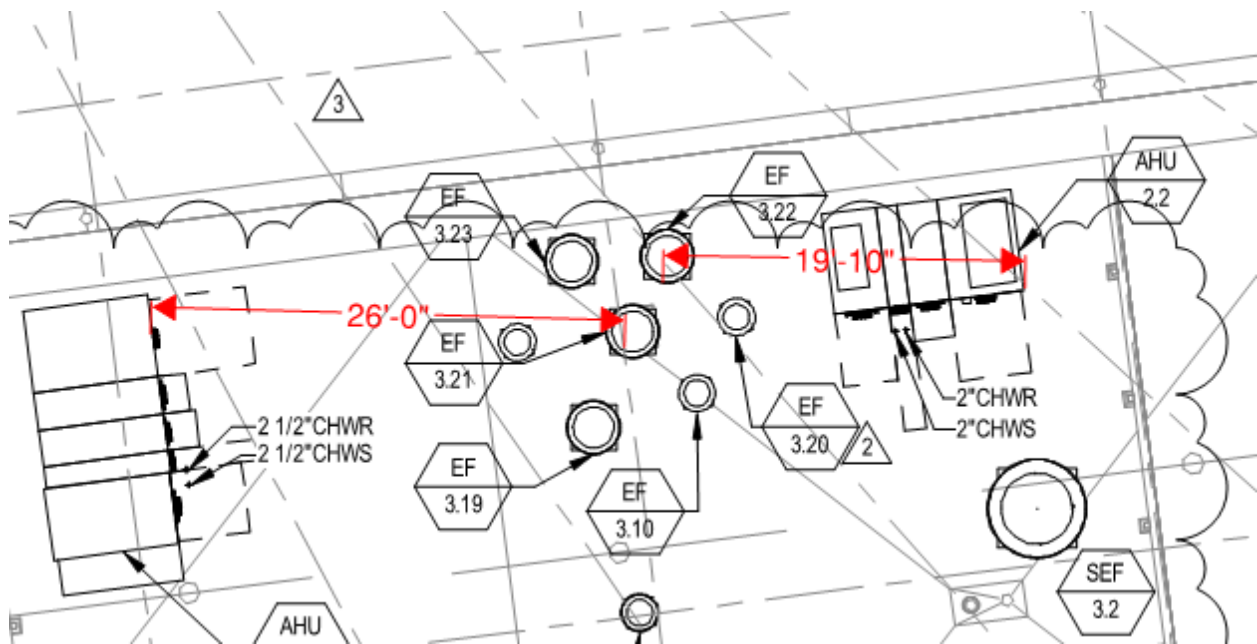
Measurements from the kitchen exhaust fans to the inlets of the air handling units are less than the required 30 feet apart.
